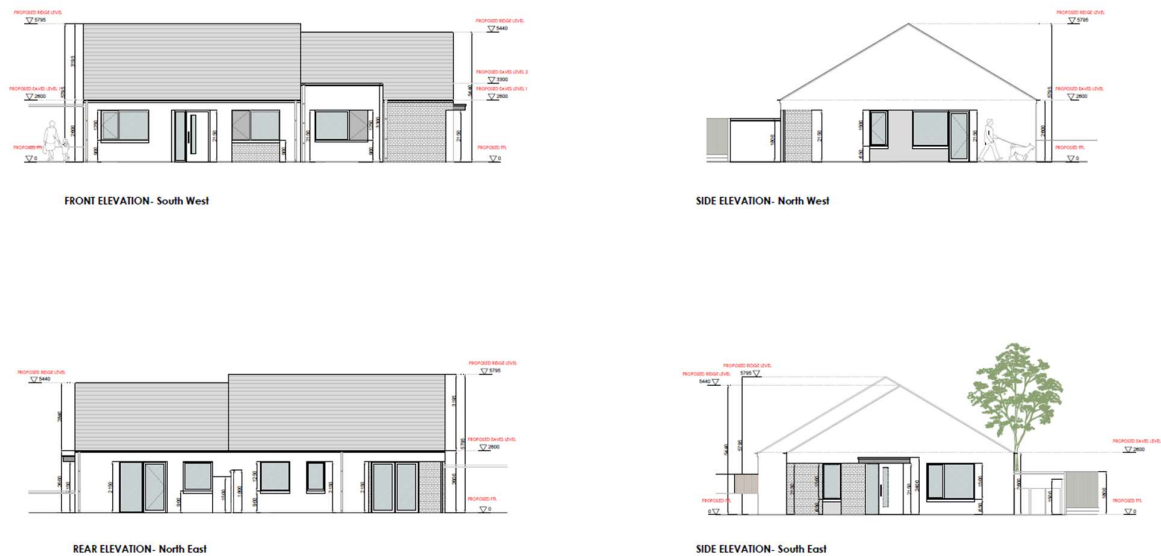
Proposed Elevations by author indicating the form, massing and material palette of the proposed dwellings.
